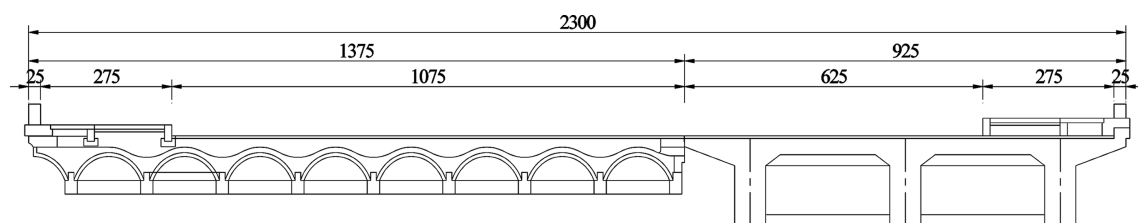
Transverse section of Jilin highway bridge (dimensions in cm)
